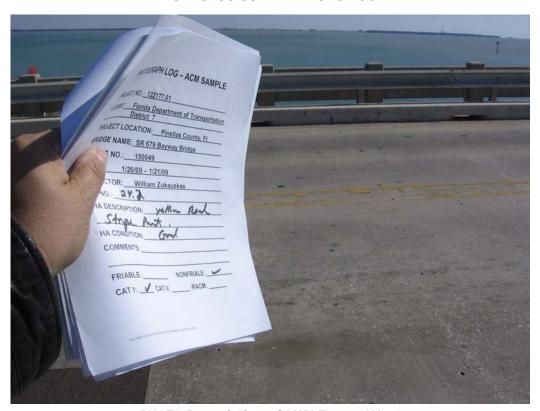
01/21/09 - SAMPLE 24.2 - HA 24 YELLOW PAINT ROAD STRIPES
